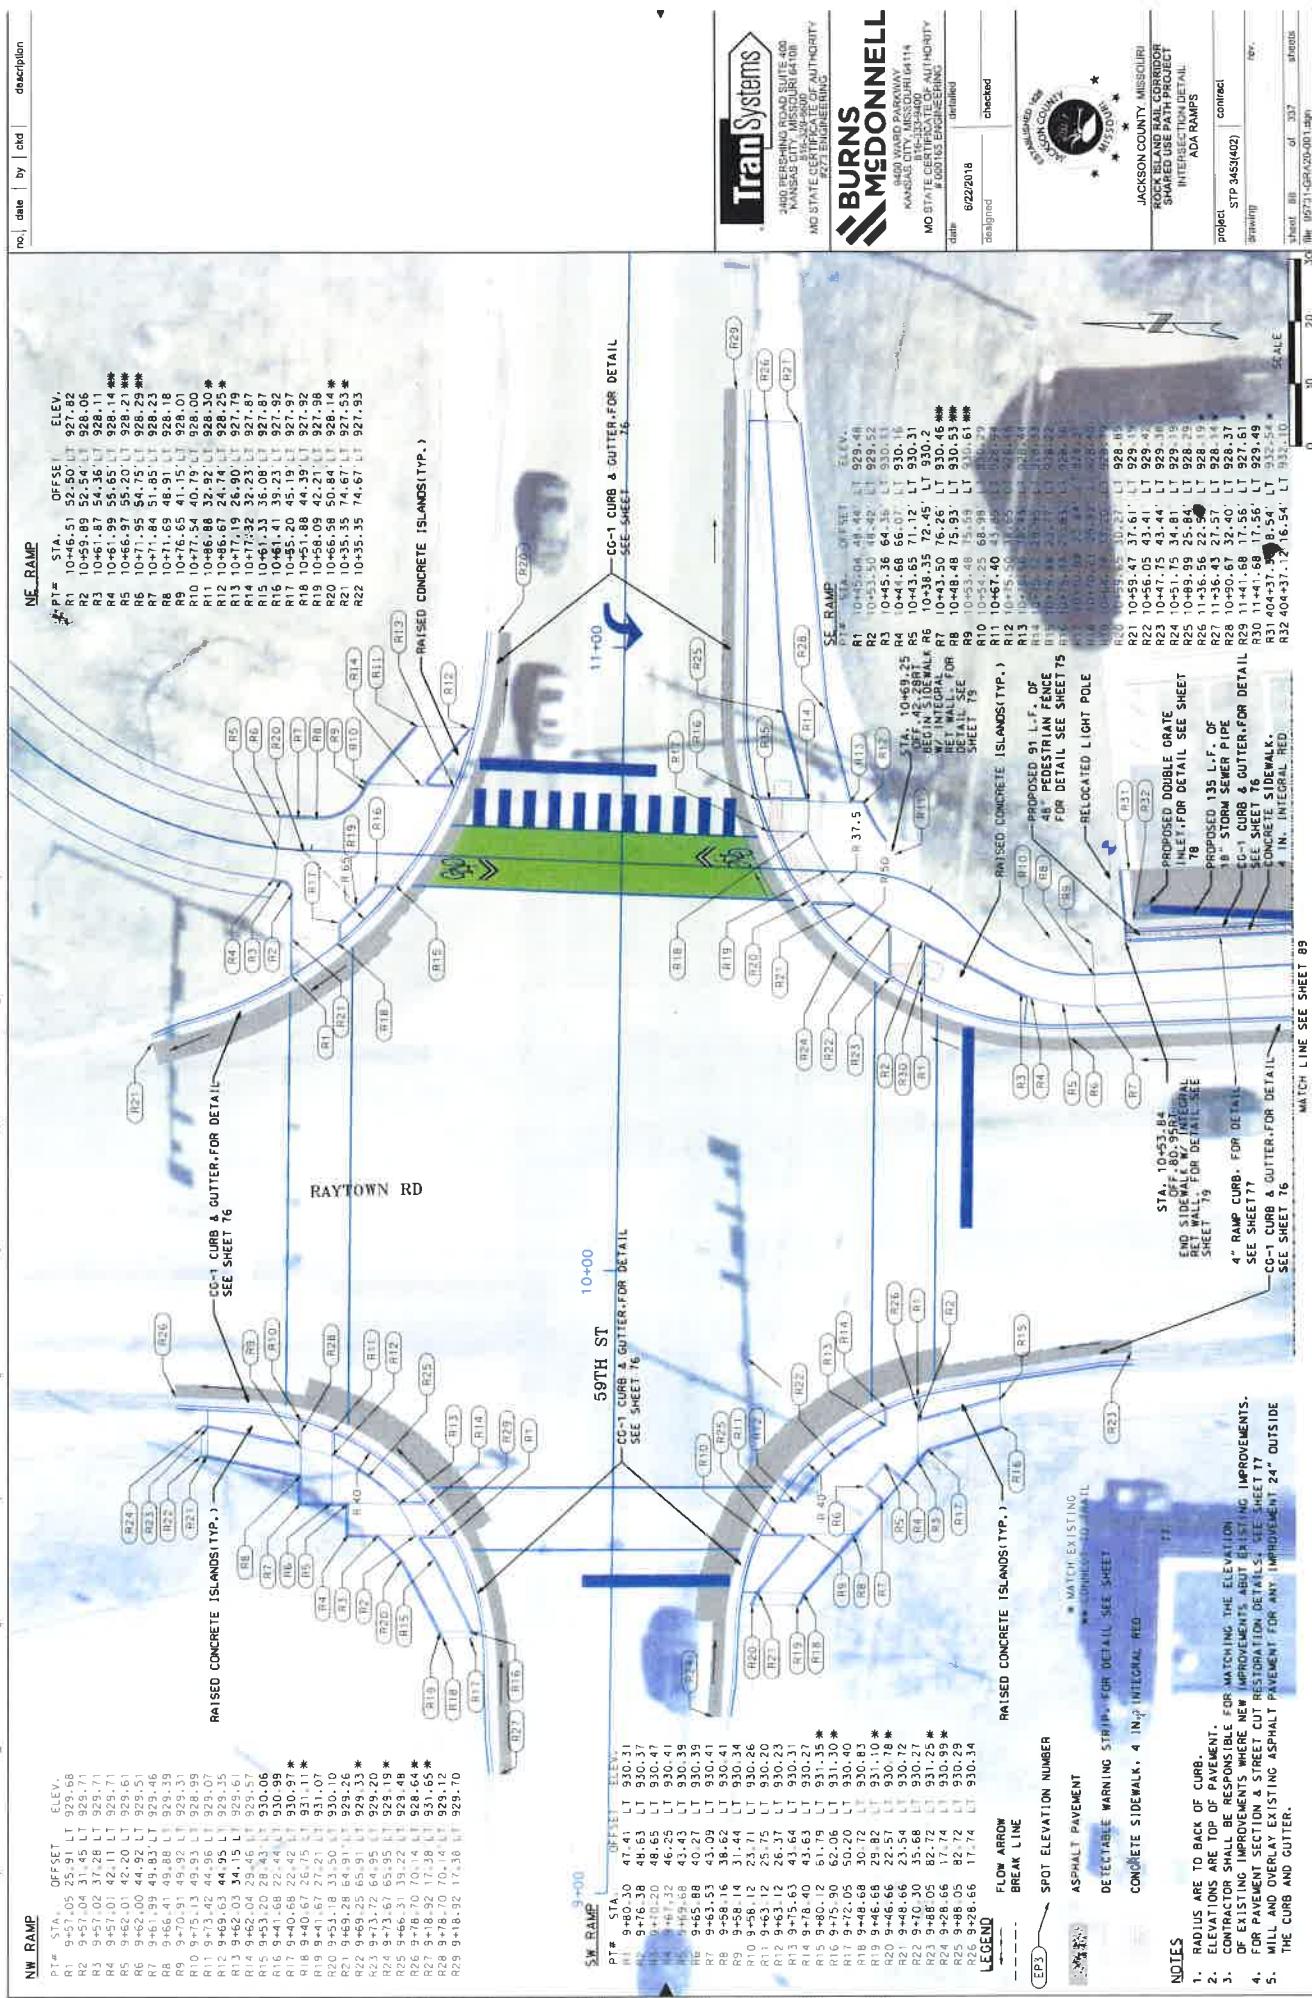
h Street and Raytown Road Traffic Signal Improvements
